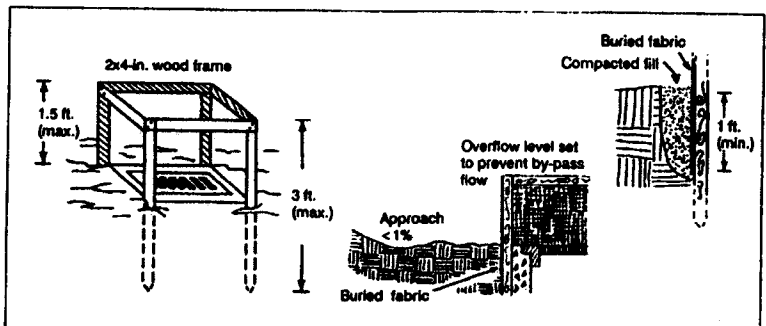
B. Supporting frame and installation of the fabric.
